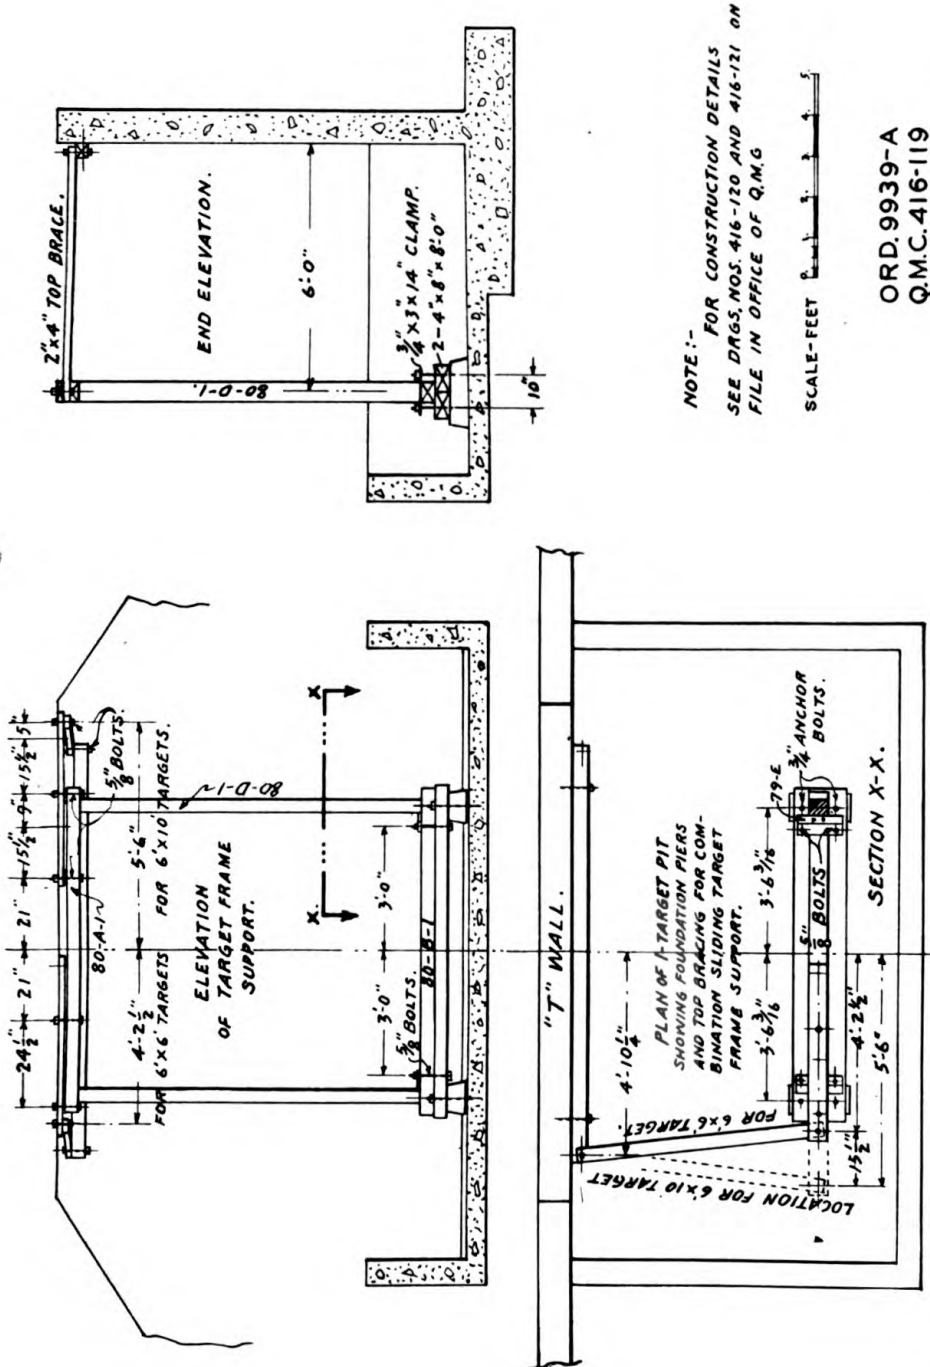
Lay-out of foundation piers and typical set-up of standard combination sliding target frame support—Continued.
